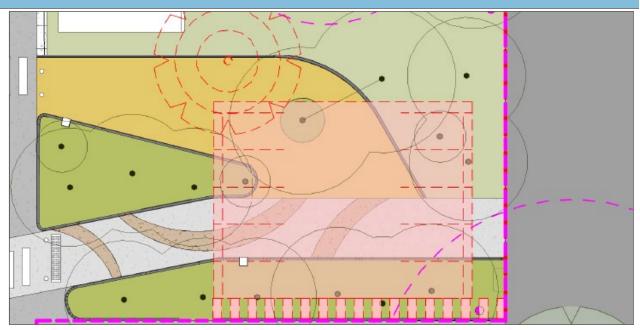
Plan of previously-approved landscaping treatment fronting Osman Street in the location of the 'temporary carpark' now proposed to be retained (approximate location shown in red shading)
